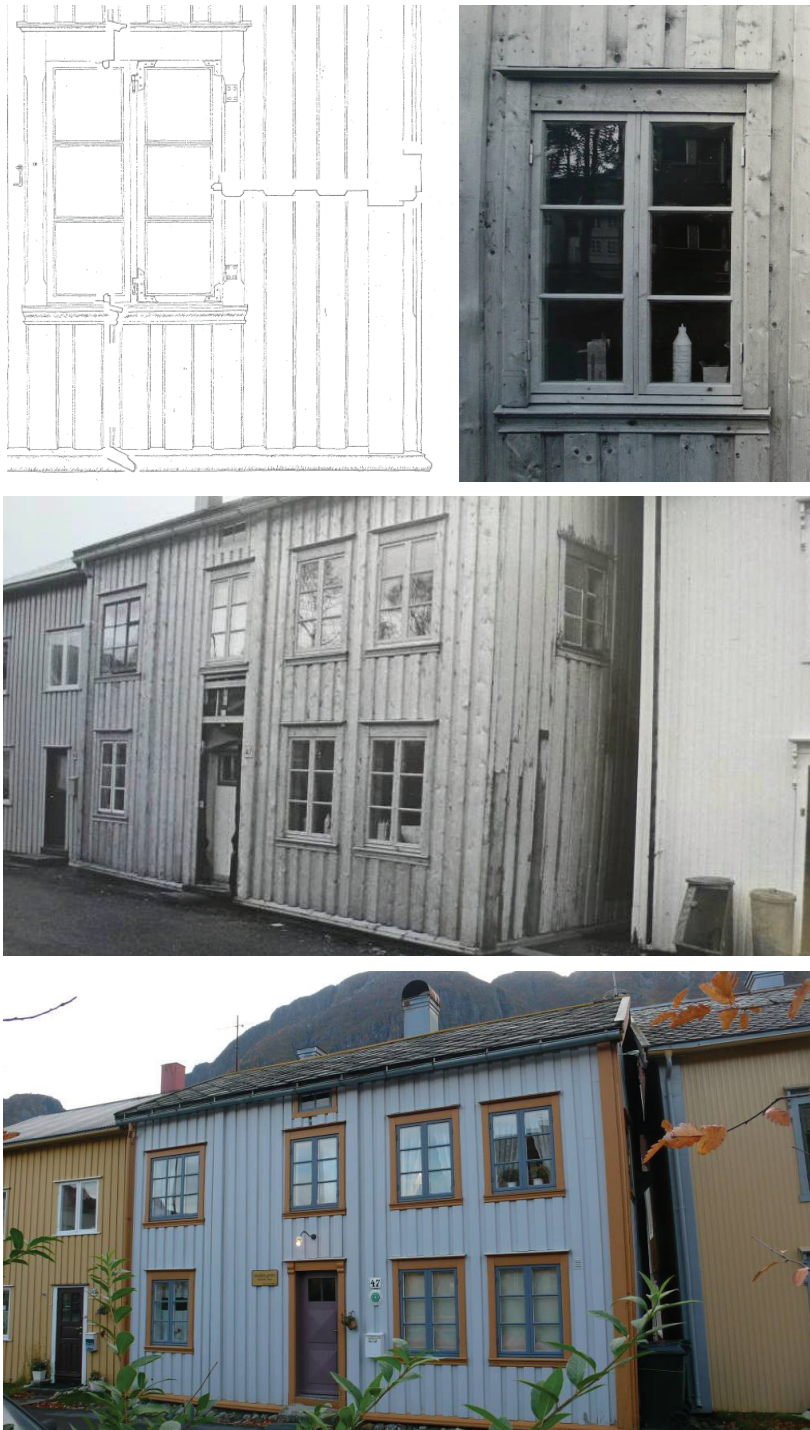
Sjøgata 47, section of façade (top left) survey 26.6.1978 Dag Nilsen, NAVF; façade during the completion of the work in the late 1970s (top right); new windows fitted (centre) street façade in 2007. (Dag Nilsen private archive; MB 2007)
